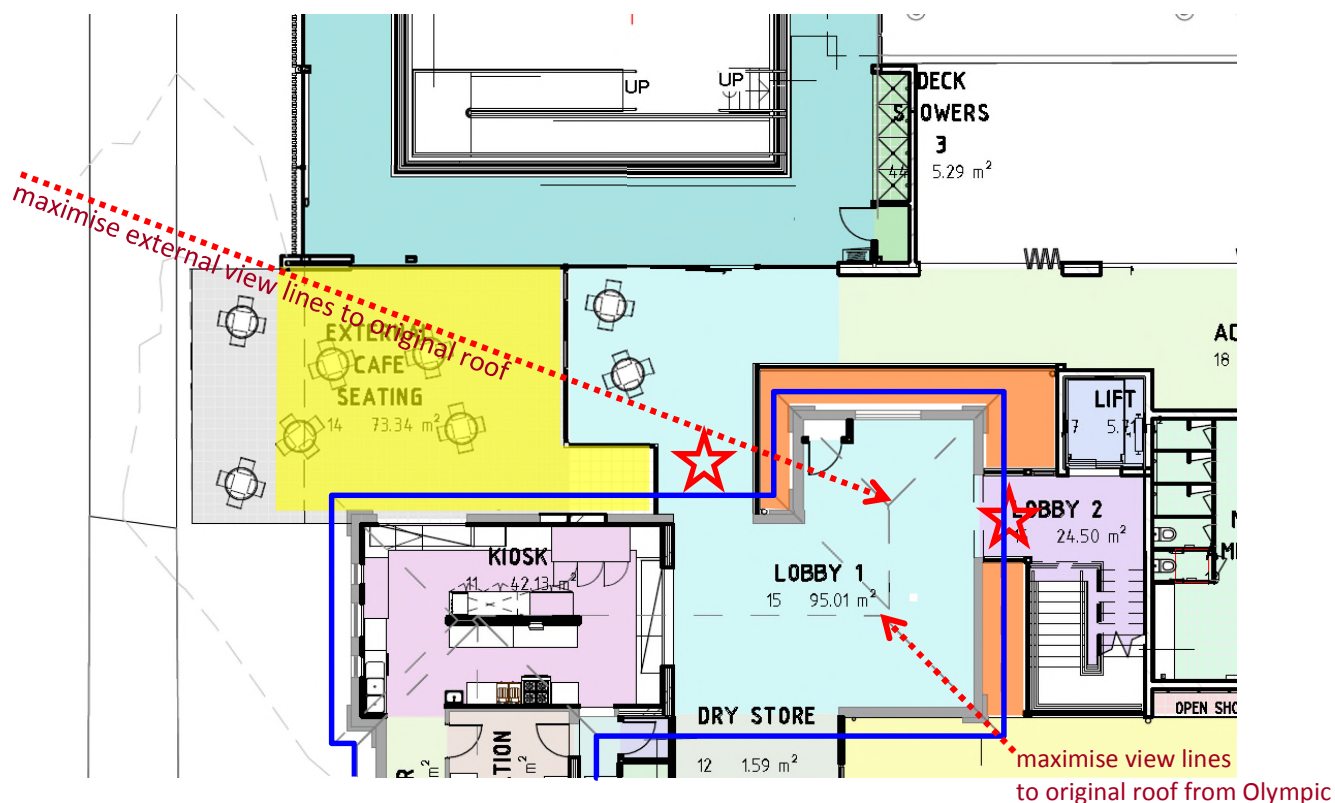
Detail of Ground Floor Plan showing treatment of separation and links:
